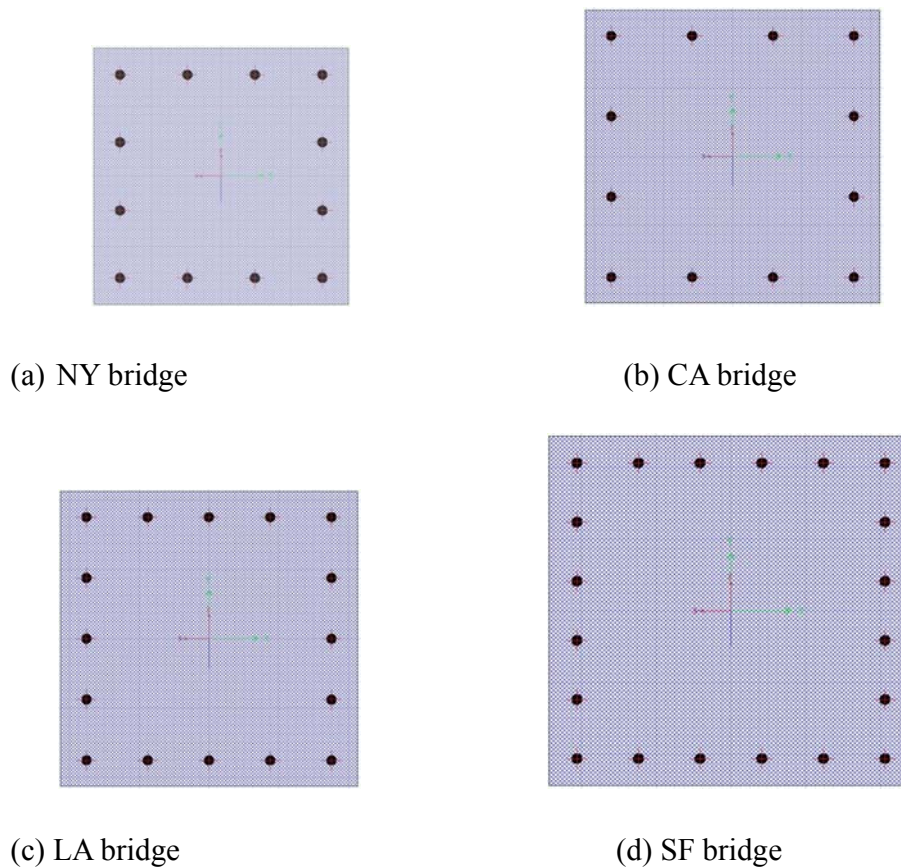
Crossing Section Configuration of the Four Example Bridges
